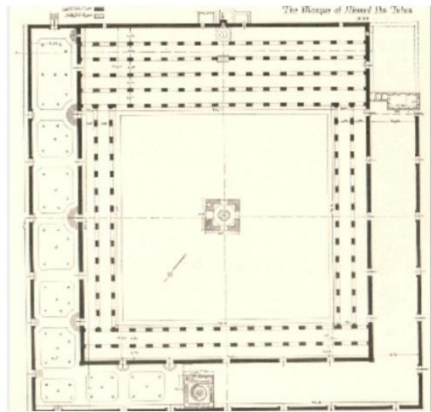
Ground plan Source: (<https://arch.net>) accessed February 20, 2021., and a suggested ground plan to be used during the tour.
